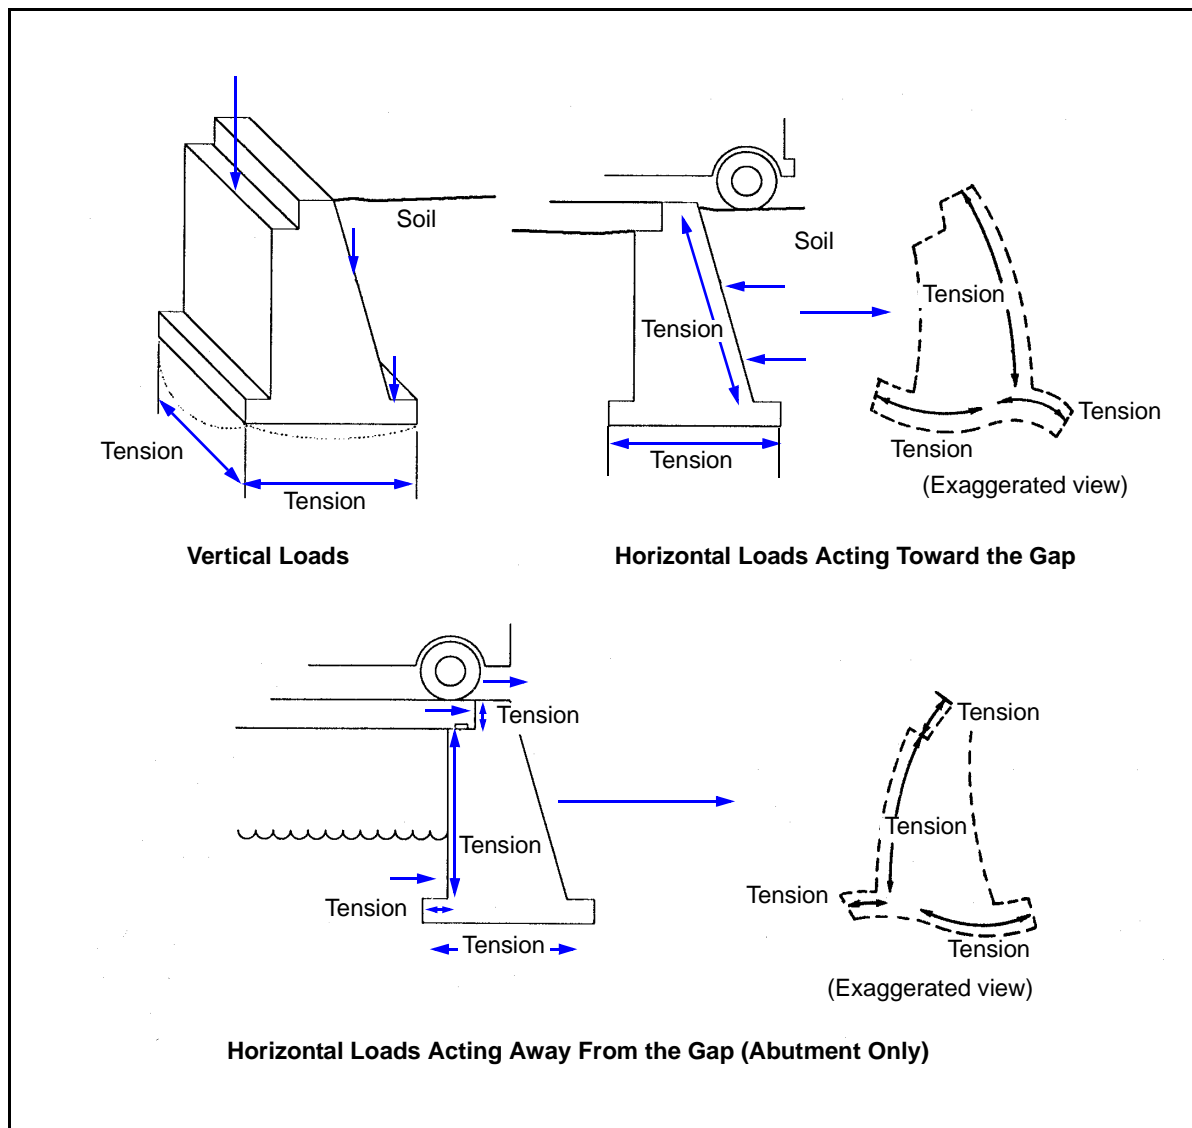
Tension Forces in a Retaining Wall or Abutment
